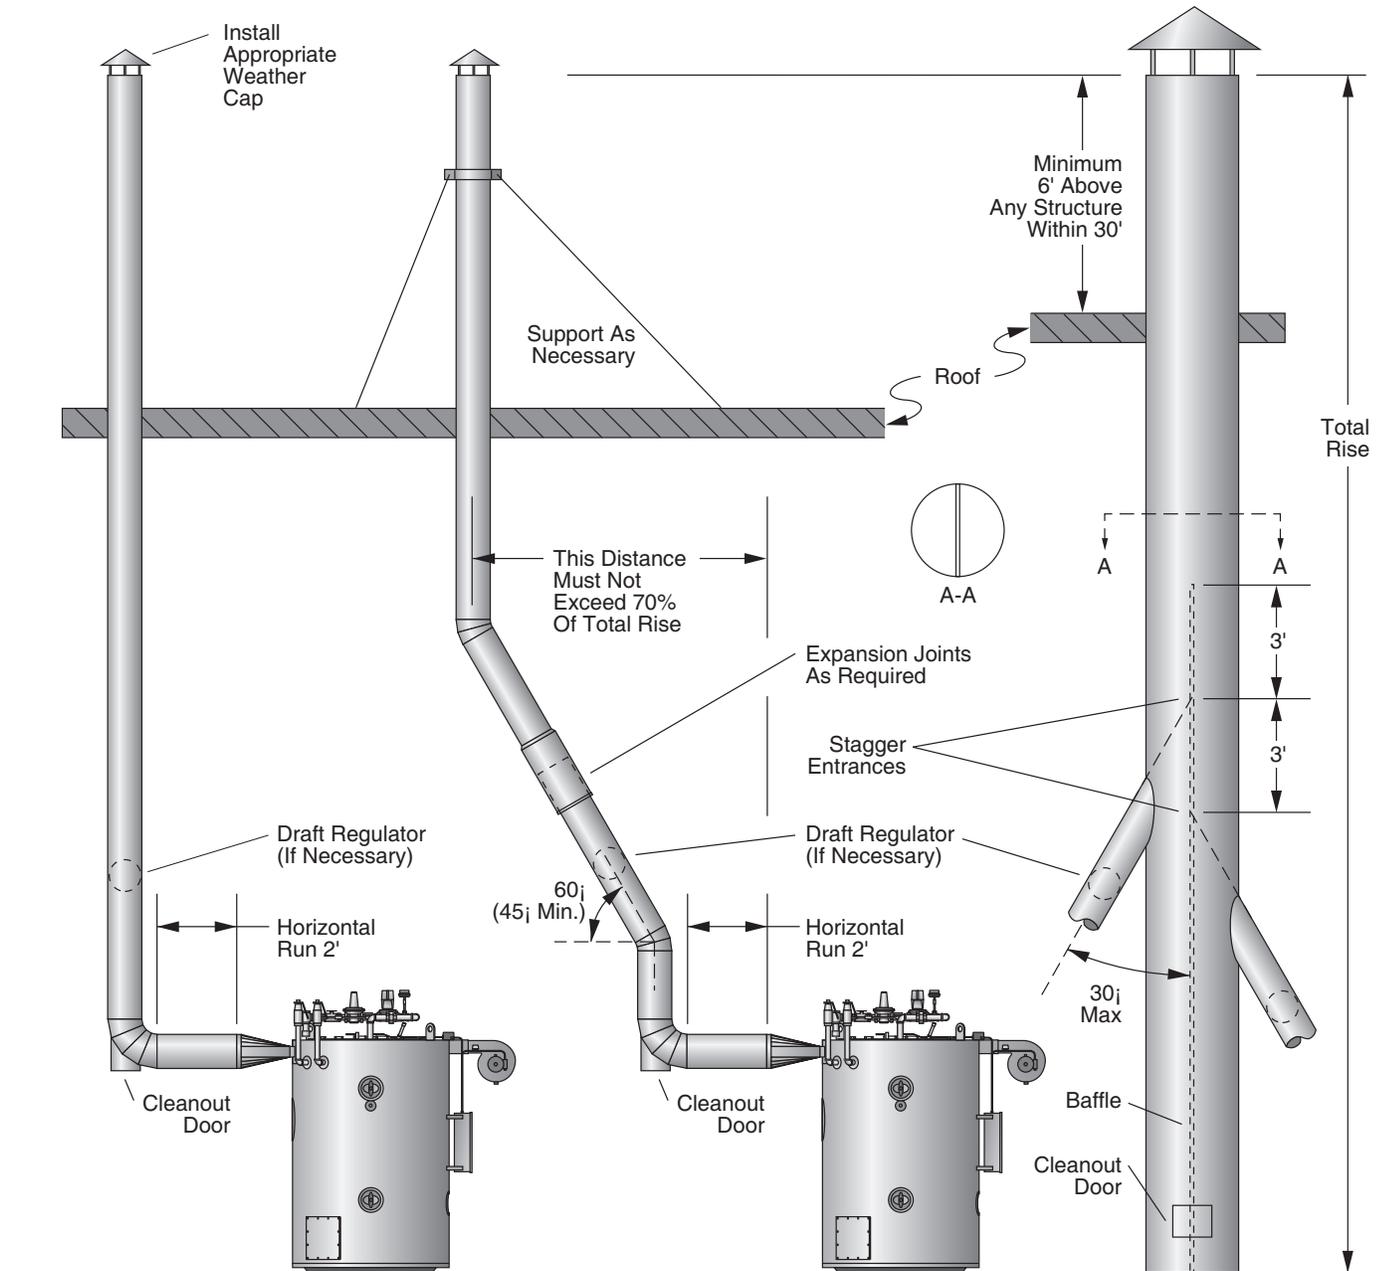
TYPICAL STACK ARRANGEMENT
